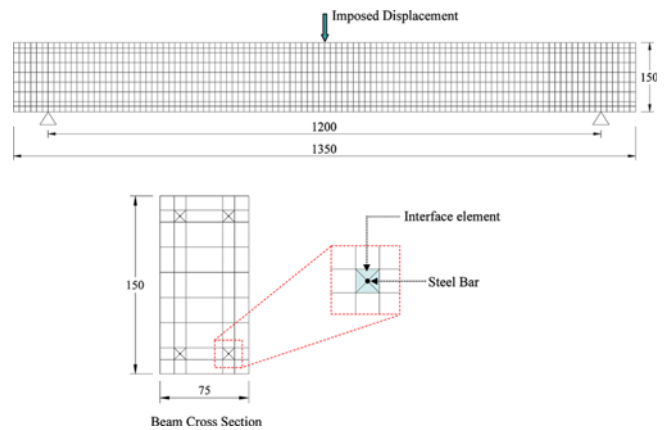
Finite Element Mesh of Reinforced Concrete Beam
